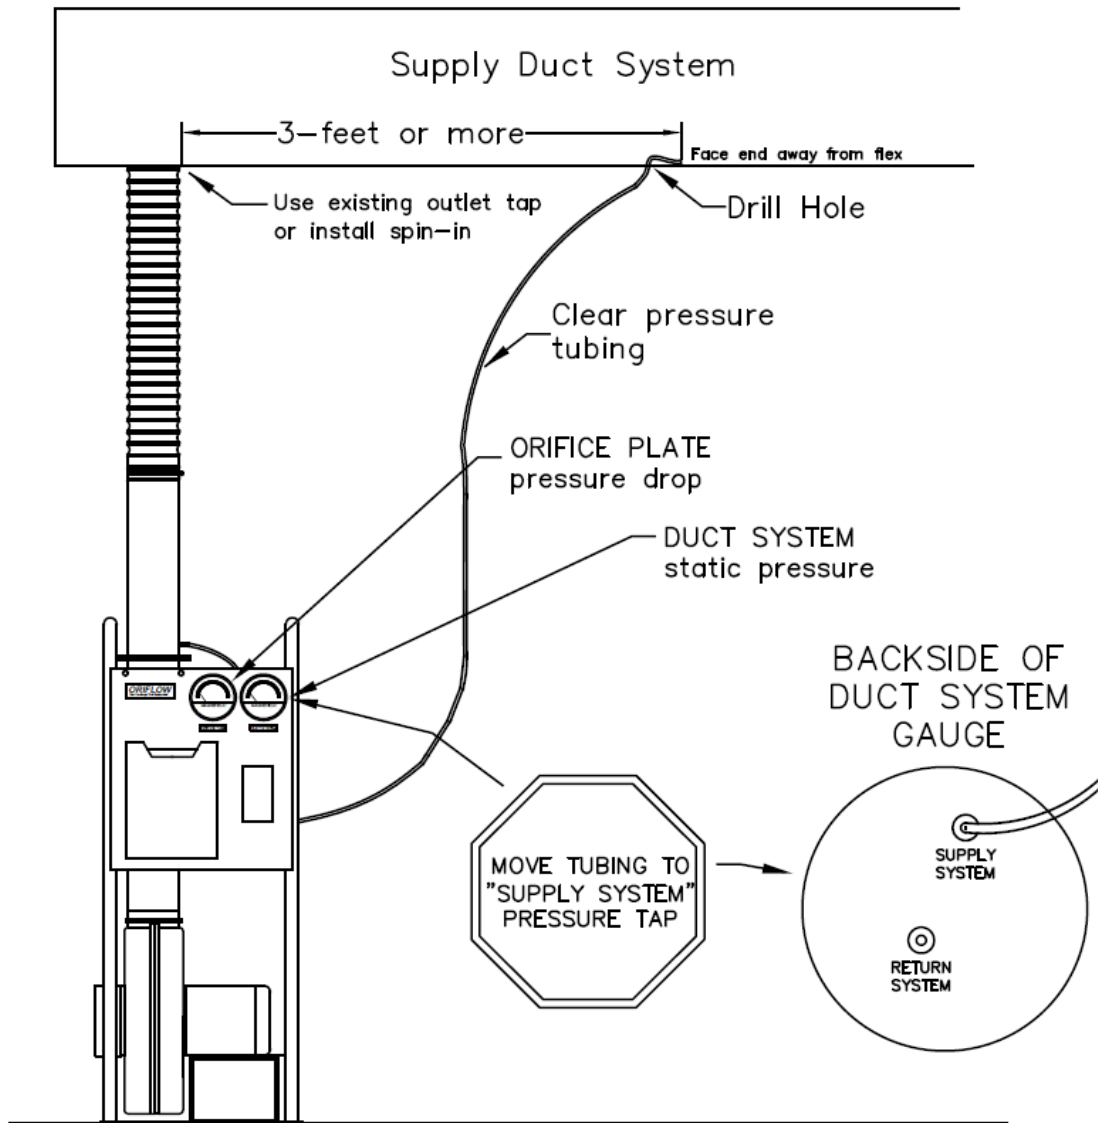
Duct Leakage Test Setup for a SUPPLY System
